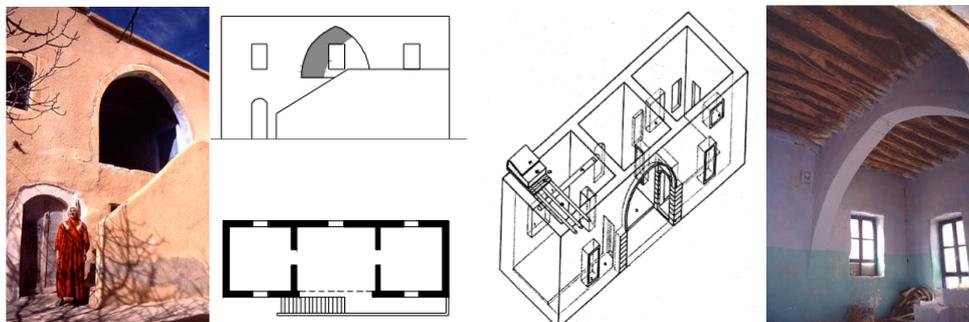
Rural house with Iwan: exterior view (left), plan, elevation and 3D section (center), and interior (right). Source: CORPUS Project.
